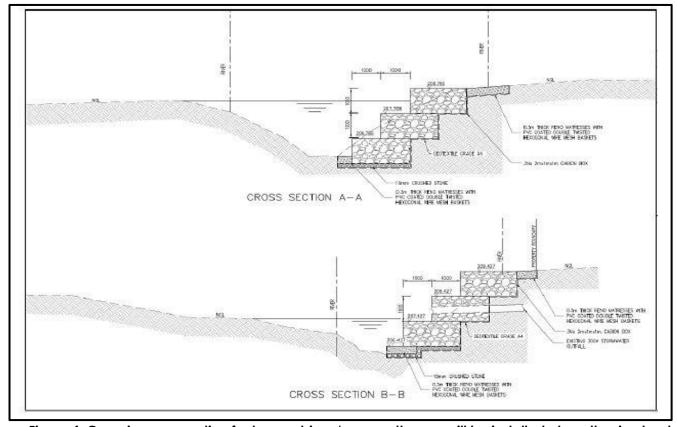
Generic cross-section for how gabions/reno mattrasses will be installed along the riverbank.
